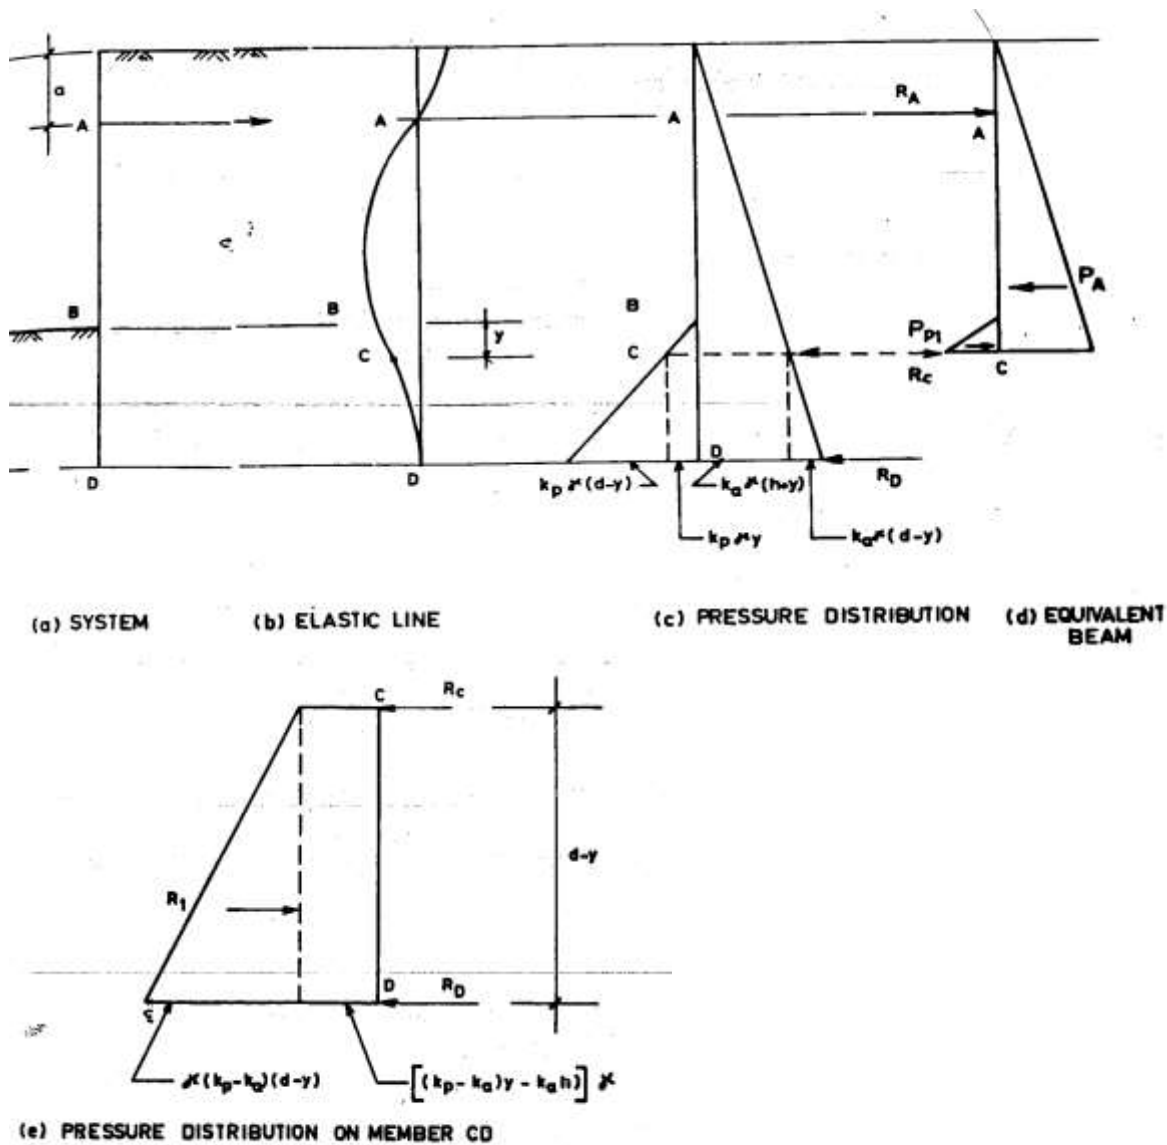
Anchored retaining wall for fixed earth support Tefera, 2000
